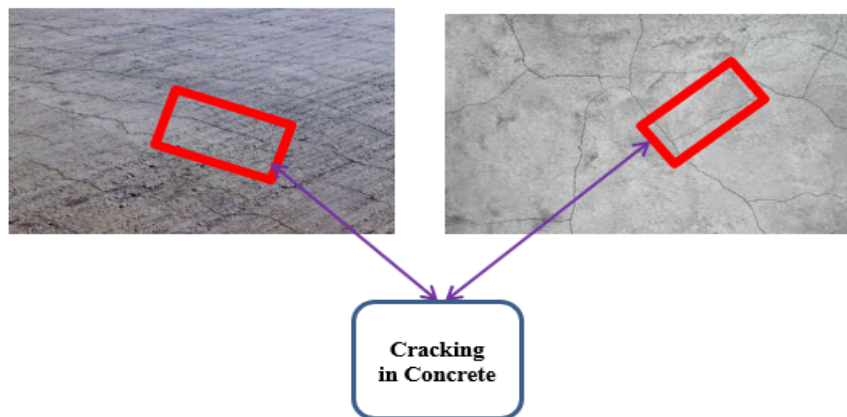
Cracking in Rigid Pavement
